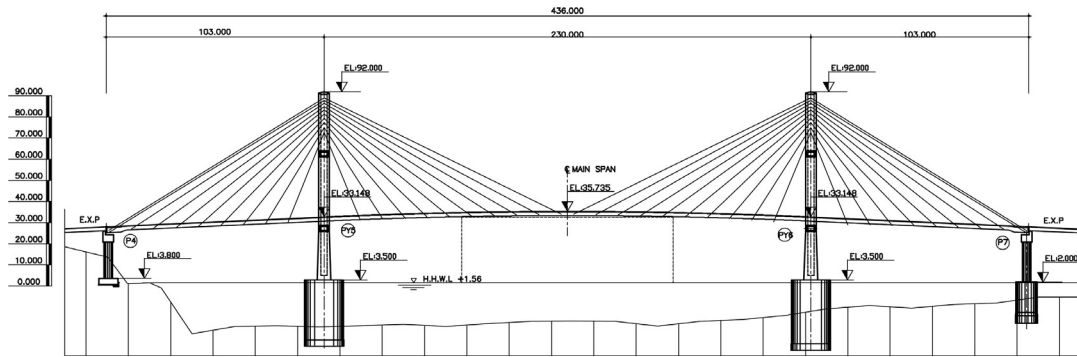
Drawing of longitudinal section of the cable-stayed bridge
